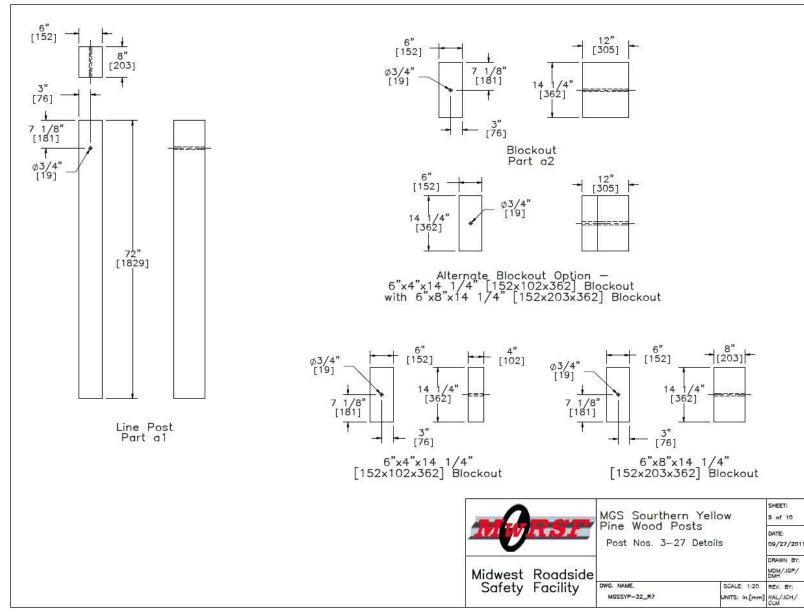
Post nos. 3 through 27 and Blockout Details, Test No. MGSSYP-2
